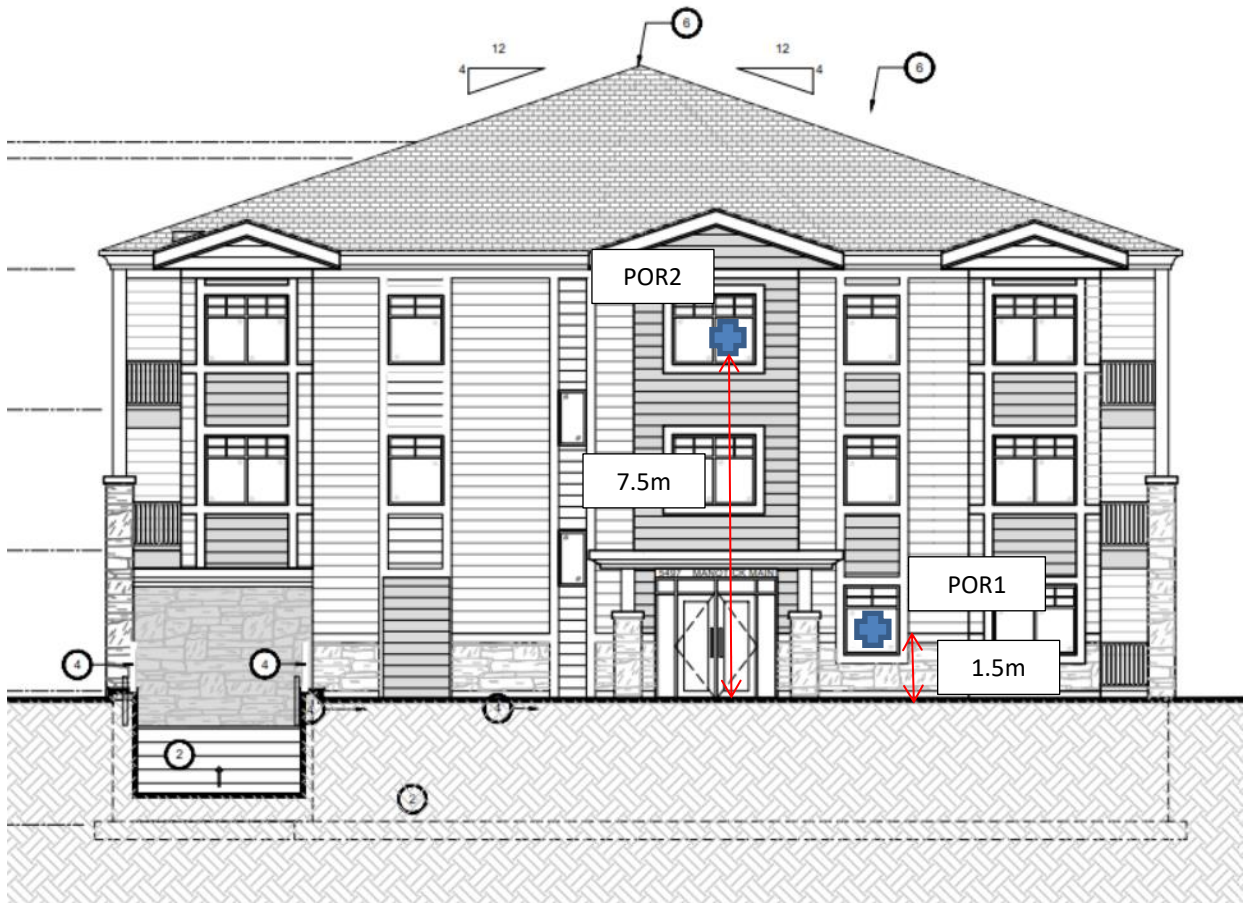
Front elevation view showing the Points of Reception (POR1 and POR2).
